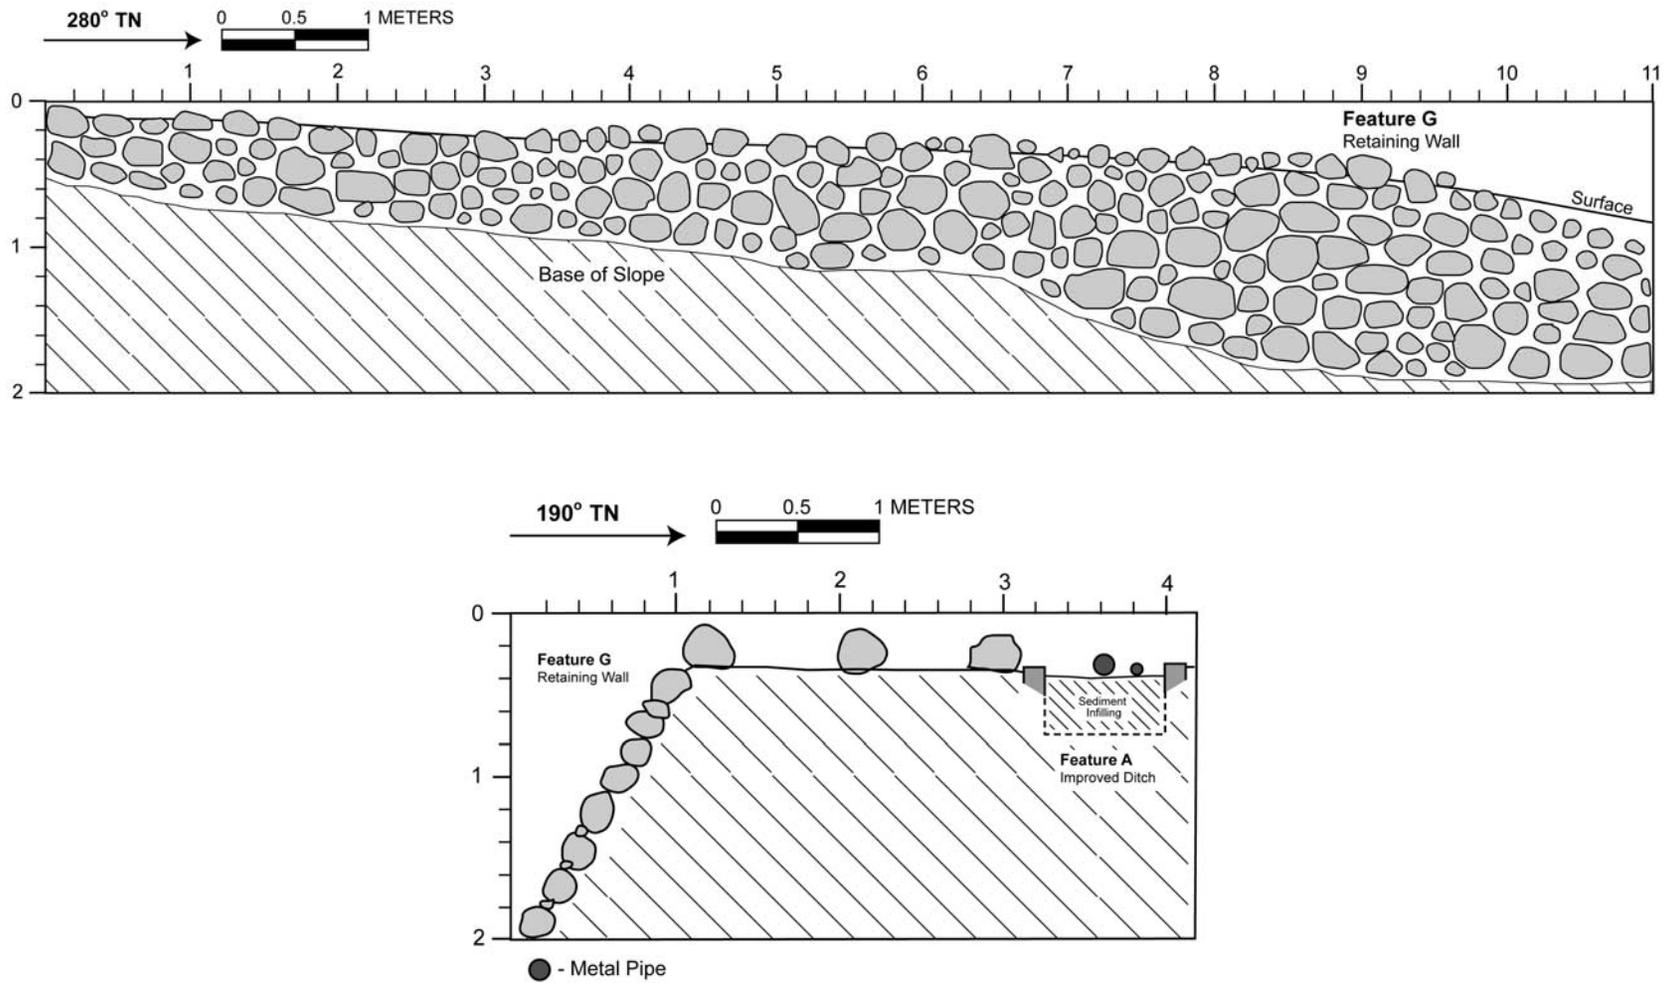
Profile (above) and cross-section (below) diagrams of SIHP # 50-80-07-6895 Feature G retaining wall
